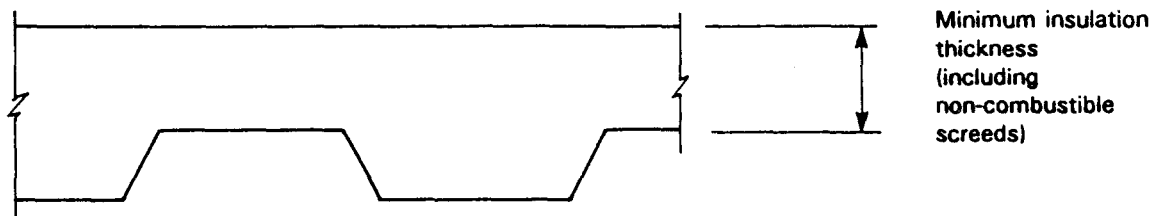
Measurement of minimum insulation thickness of concrete for trapezoidal decks
